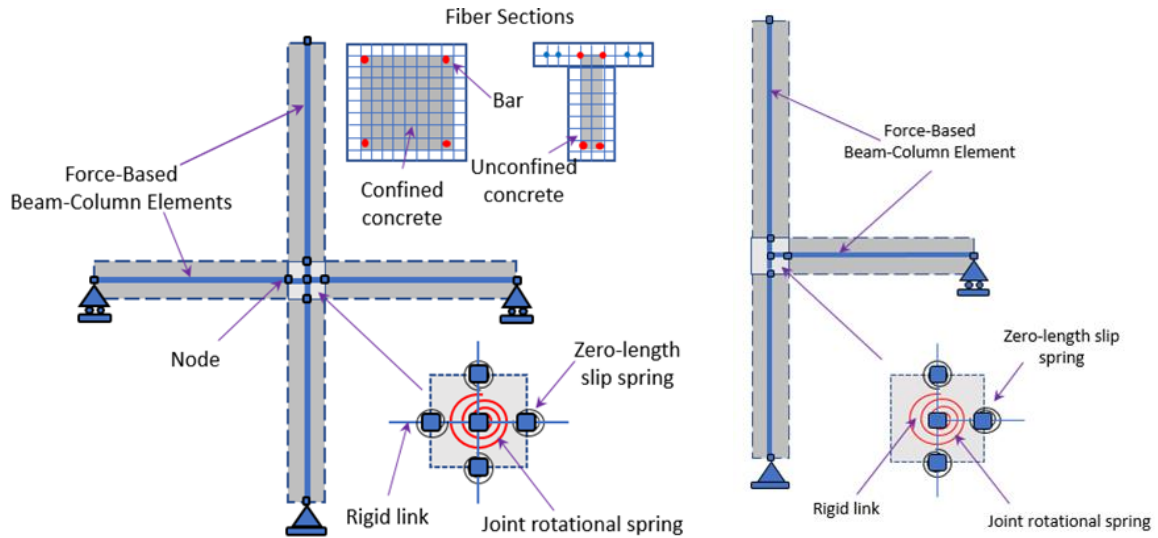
Modelling details of substandard reinforced concrete beam-column joint assemblage
